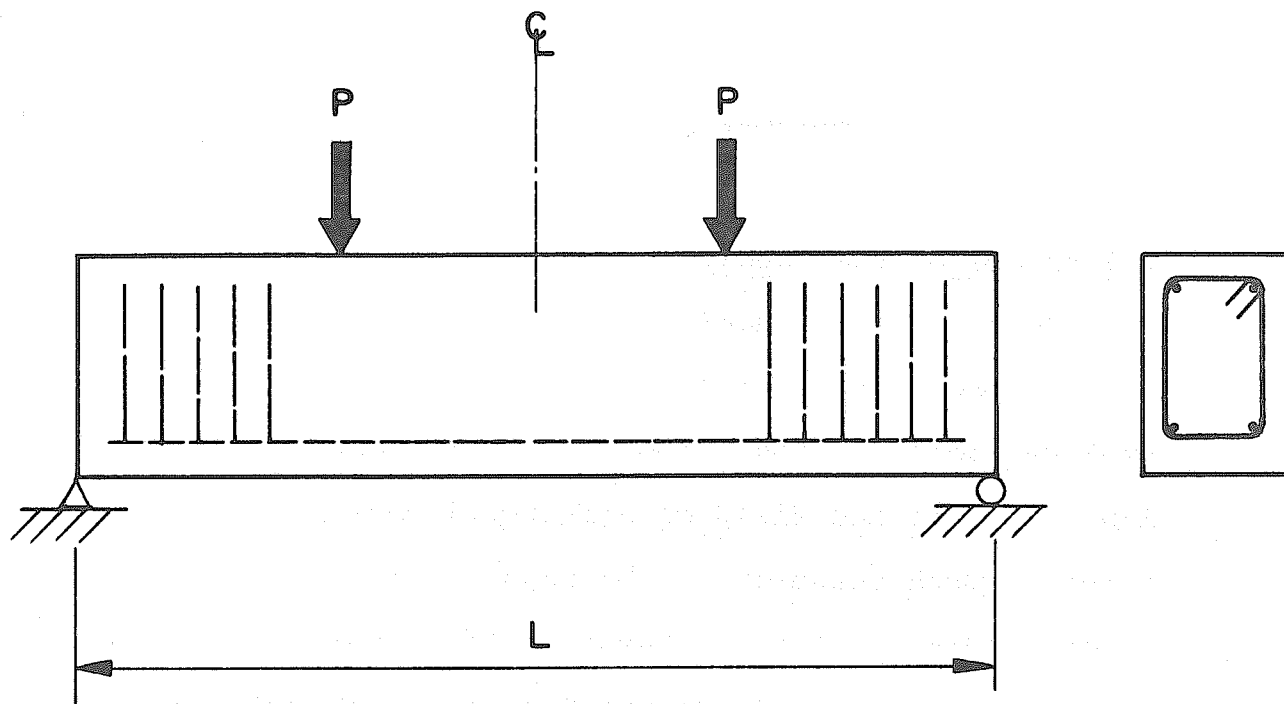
A SIMPLE REINFORCED CONCRETE BEAM
